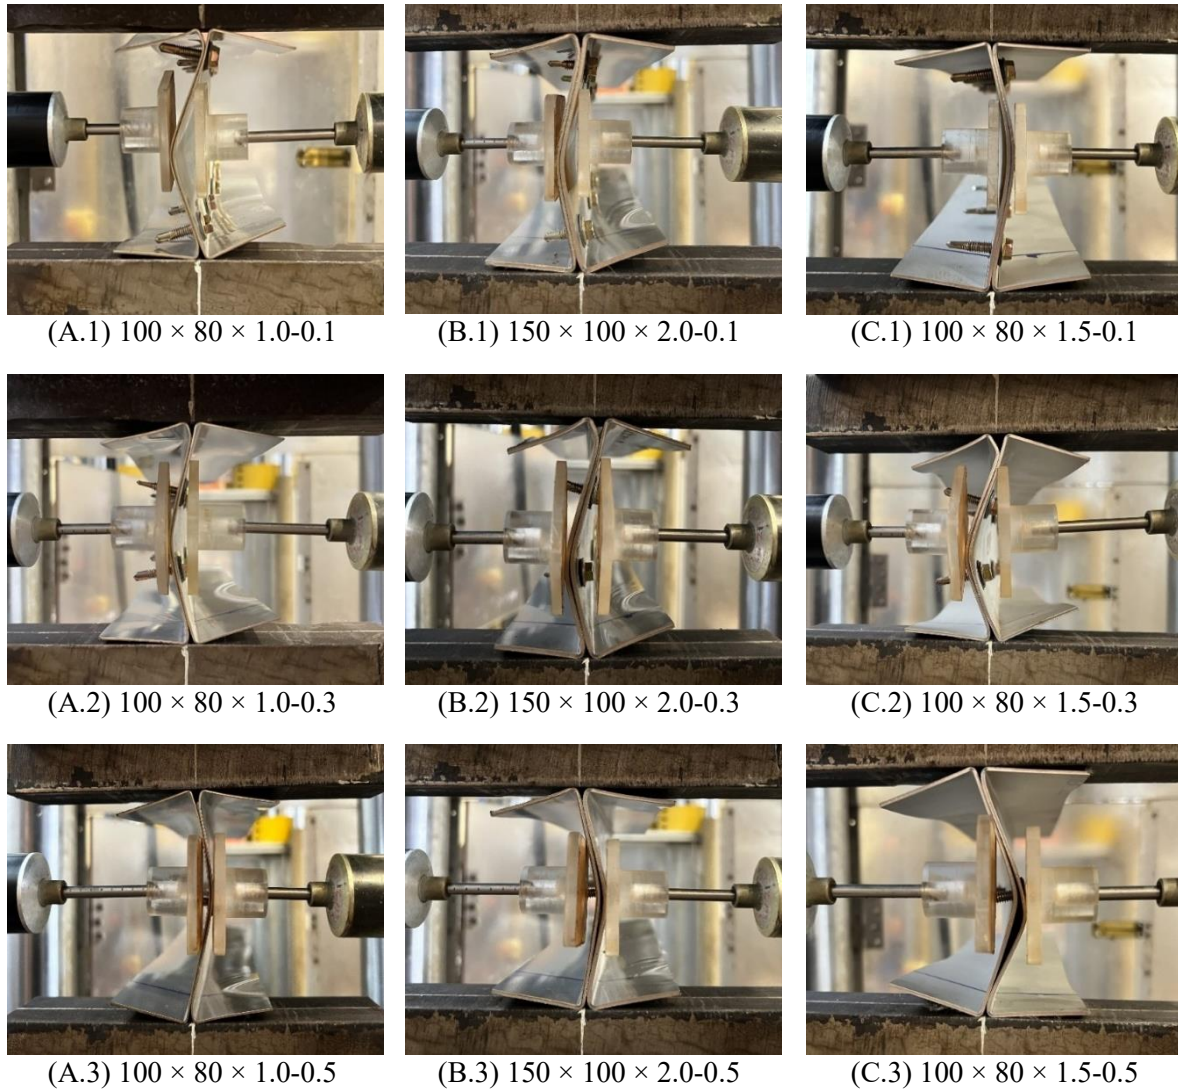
Web crippling failure modes of stainless steel built-up I-section specimens.
